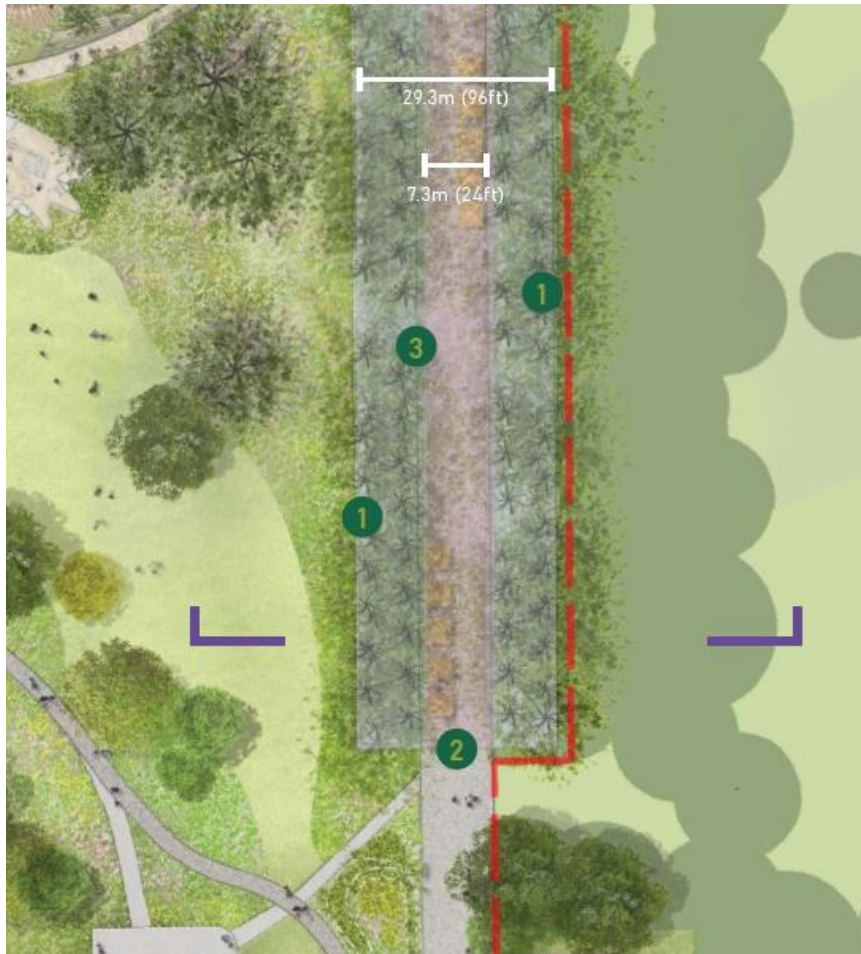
Illustrative plan of the improvements to the Grand Centre Walk
